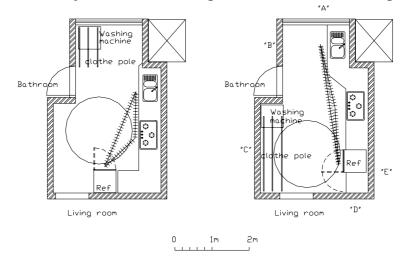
(Left) L-shaped countertop (Kitchen 7879-01, layout 2); (Right) one wall countertop (Kitchen 7879-01, layout3).
